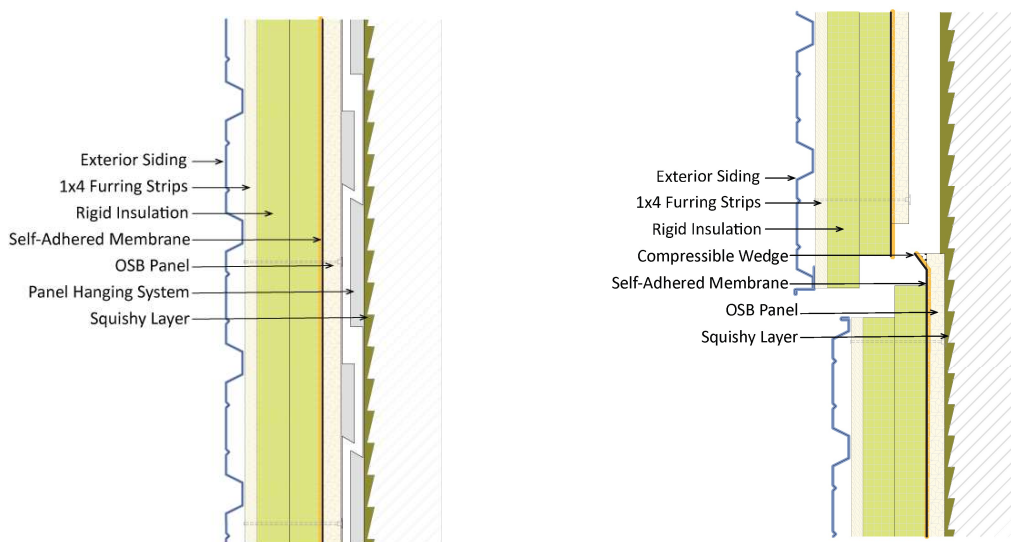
French Cleat Hanging System Diagram and Horizontal Panel Connection Detail Diagram (Section View)
